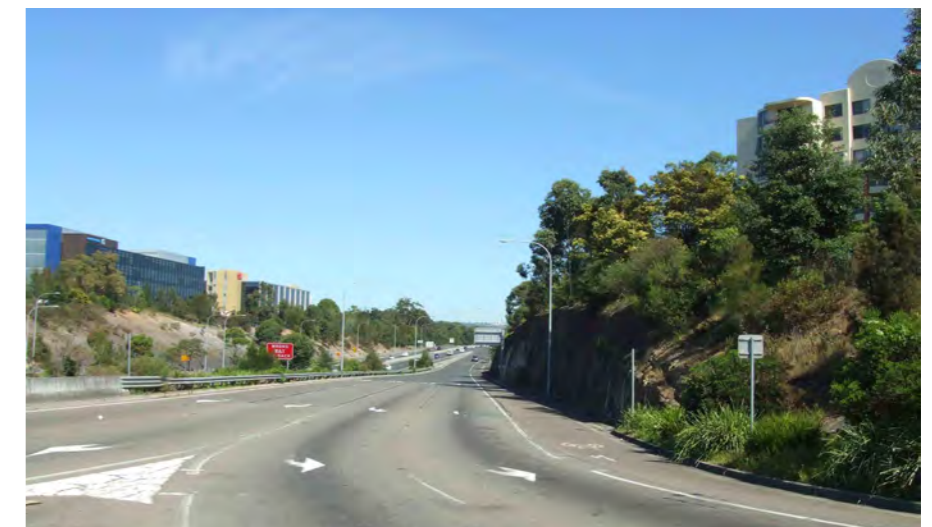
View from Lane Cove Road of office/commercial buildings overlooking the motorway.
